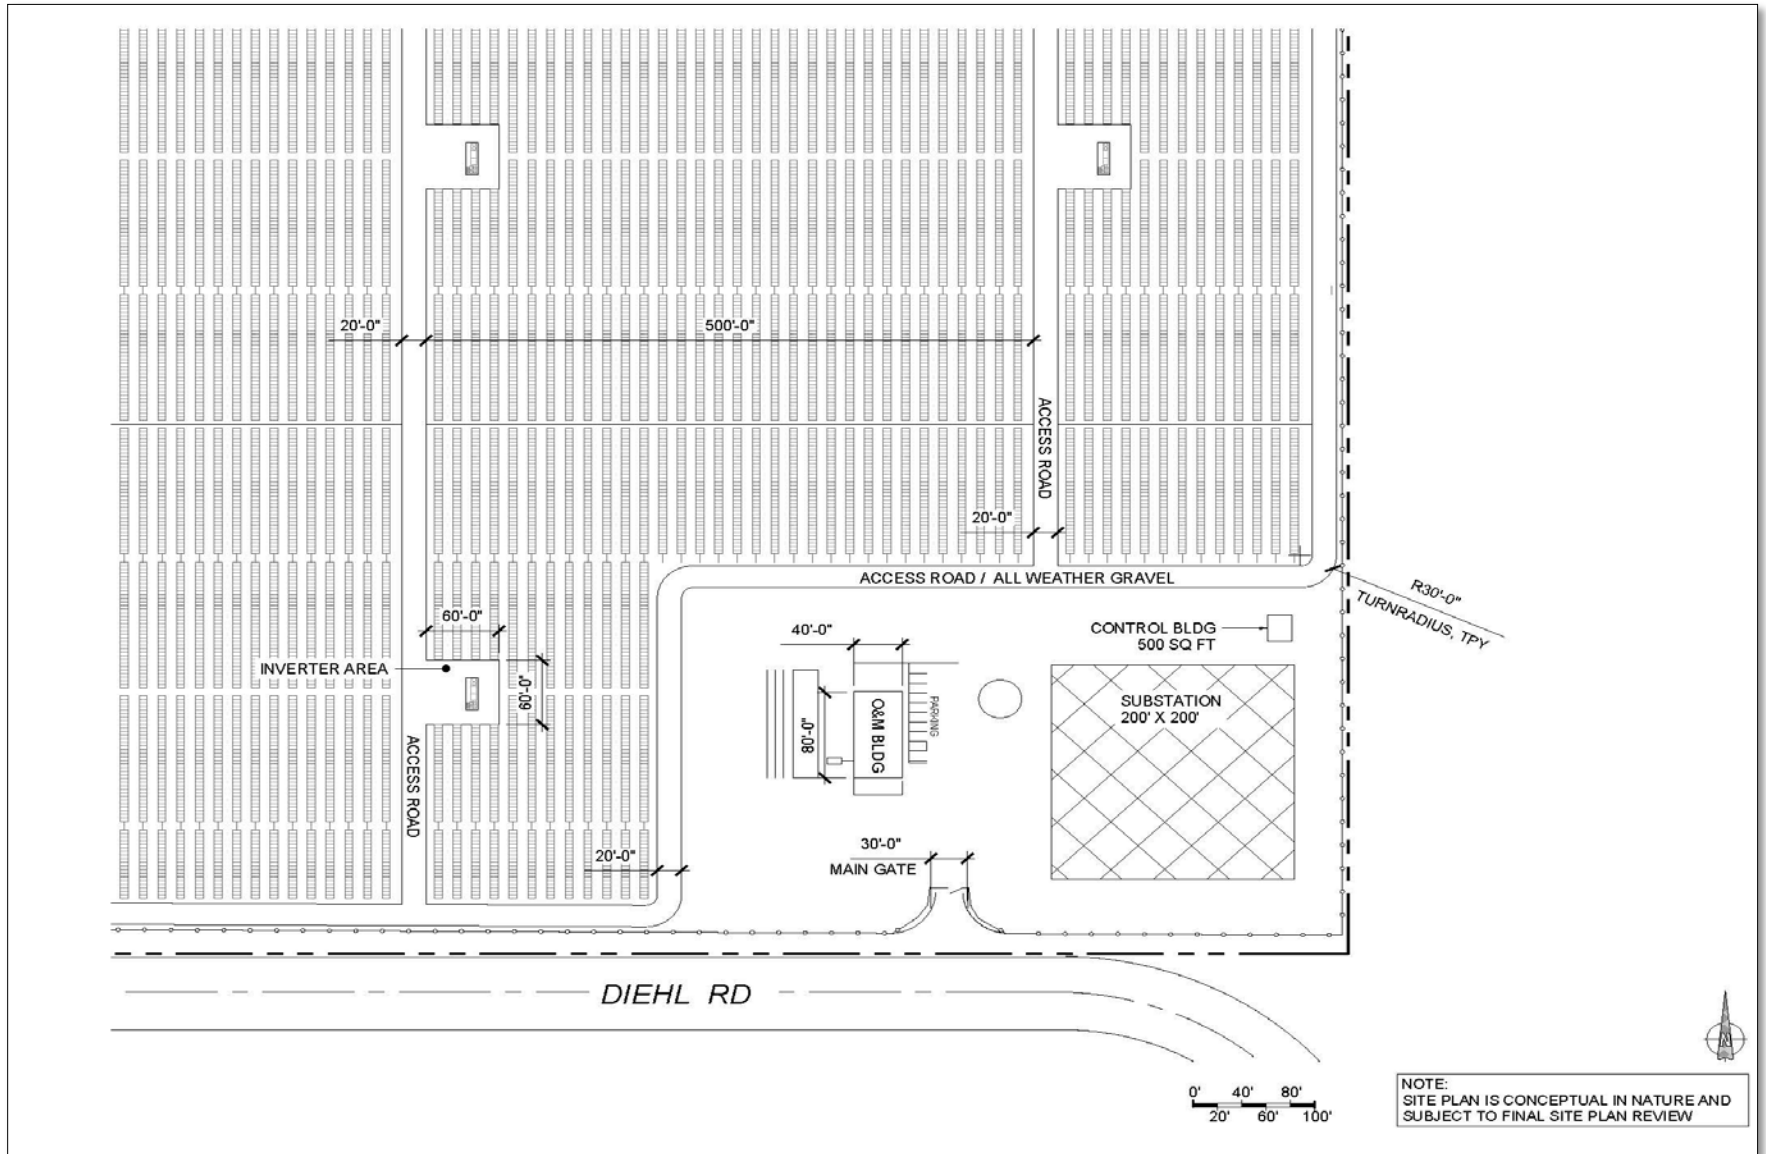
Laurel Solar Farm 4 – Site Layout
